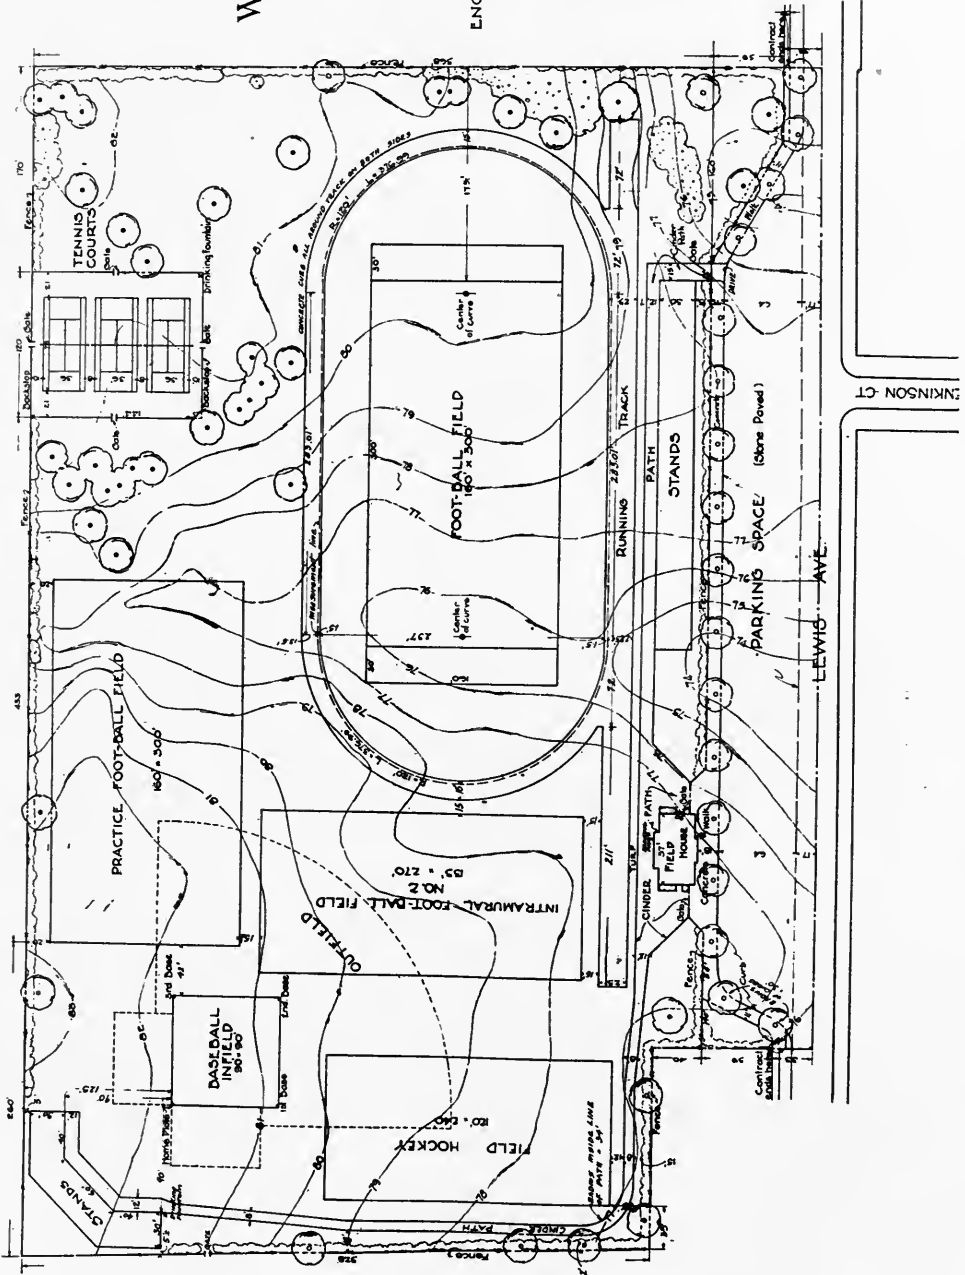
GENERAL PLAN OF FIELD, WAUKEGAN, ILLINOIS
